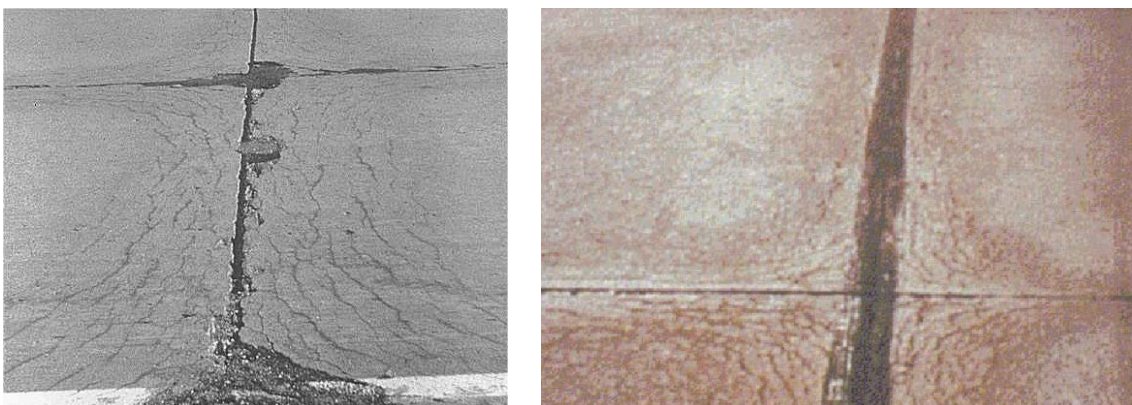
EXAMPLES OF DURABILITY CRACK IN A SLAB ((PAVEMENT INTERACTIVE, 2014 B)
